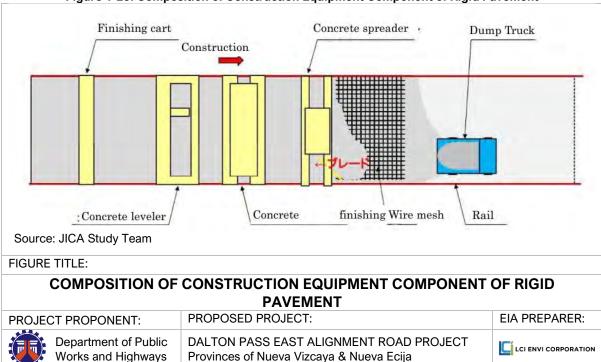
Composition of Construction Equipment Component of Rigid Pavement
